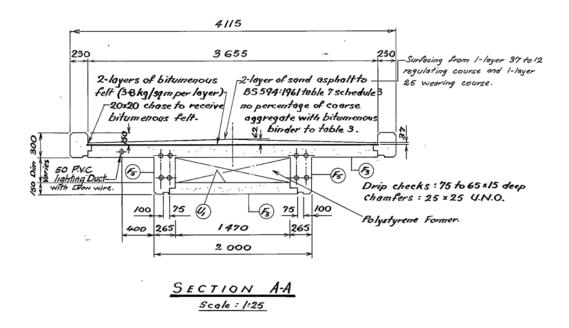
Deck cross section (Extract from Record Drawing ER6D/S73/1)
